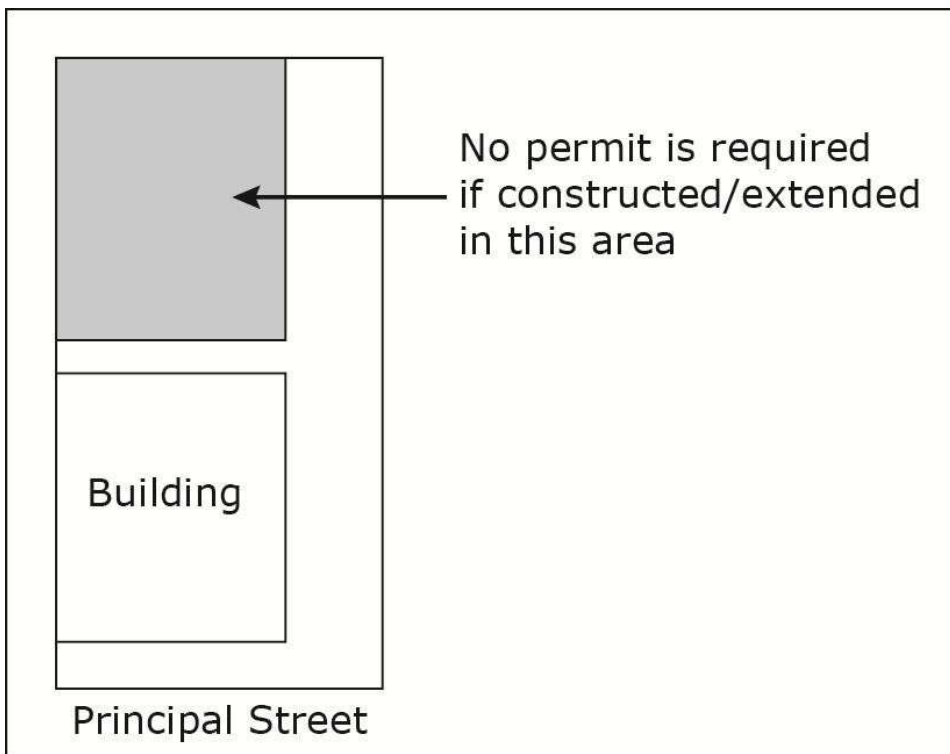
Construction/extension of outbuilding to a contributory property (not located on a corner site).
